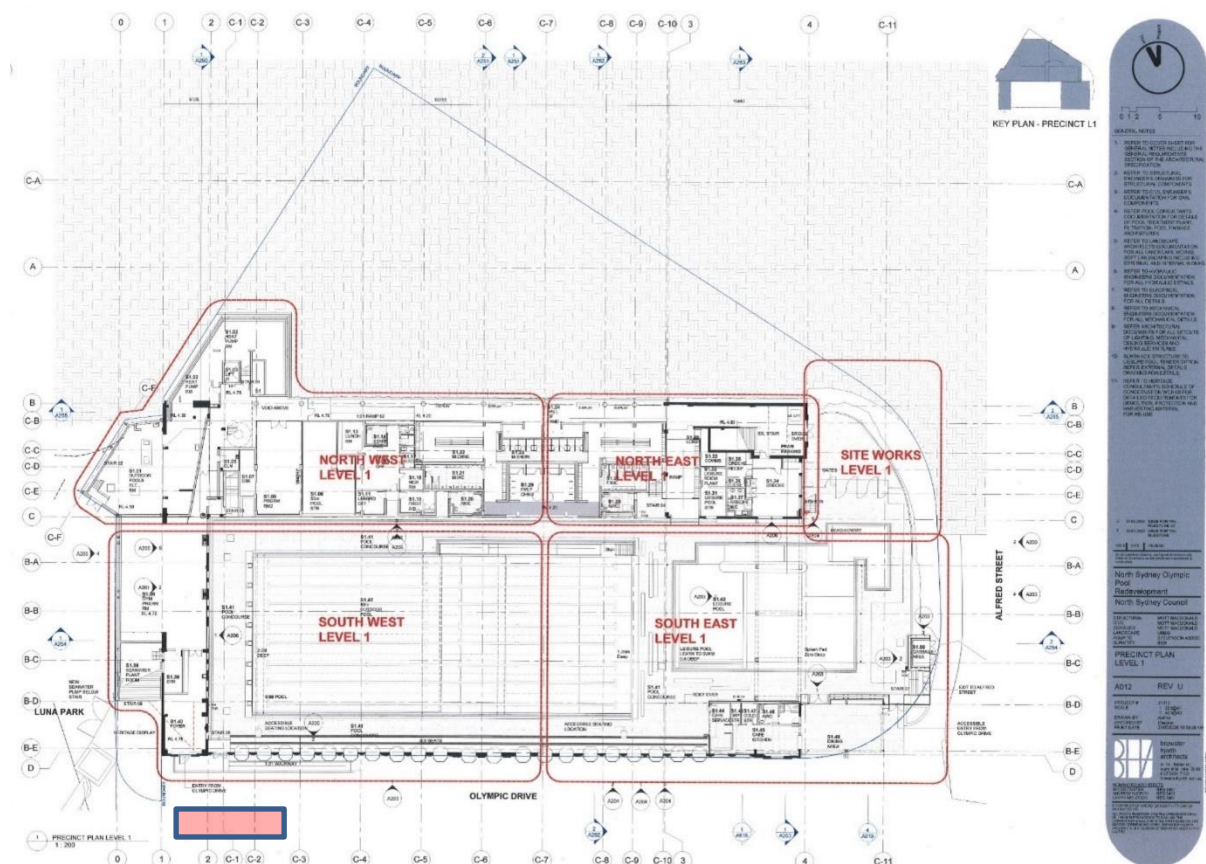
Architectural Plans Ao12 – Rev U – Level 1 Plan showing location of access ramp.
